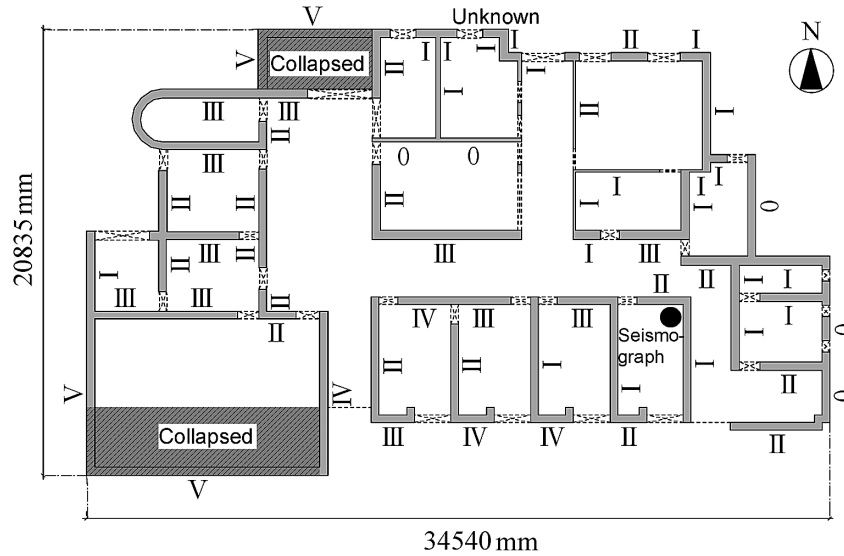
First floor plan and damage levels of masonry walls of Governor's Building.
